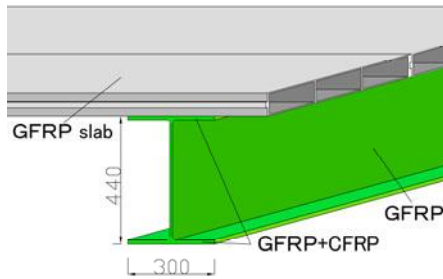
Schematic view of hybrid composite girder and GFRP slab
